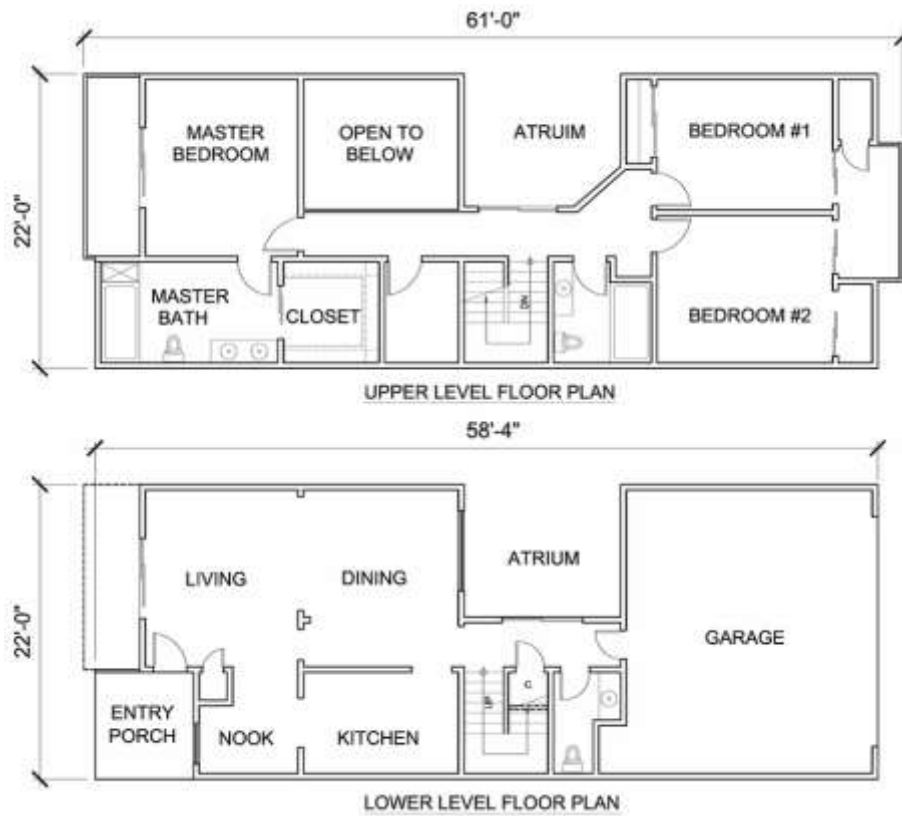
Full scale townhouse building (Excerpted from Christovasilis et al., 2009)
